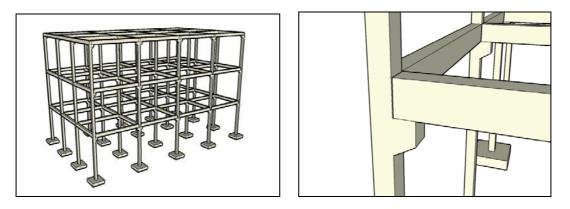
The application of simple beam-to-column connections in precast concrete skeletal frame
